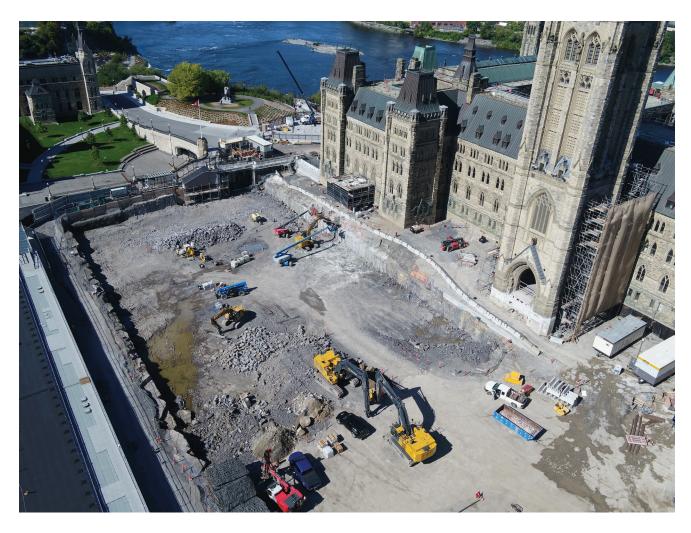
Excavation for The Visitors Welcome Centre (Main Building)
